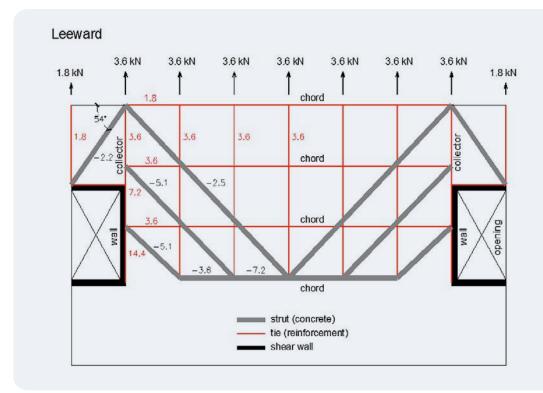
Strut and tie model for wind loads on the leeward façade.
